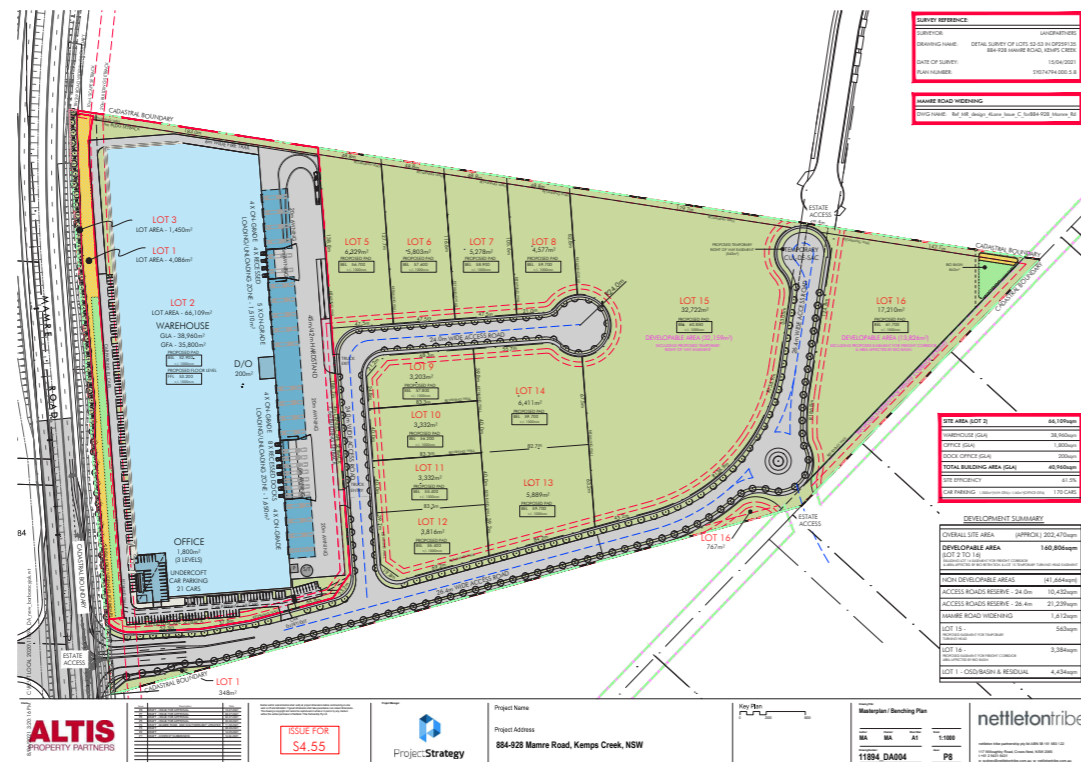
884-928 Mamre Road - Masterplan (Source: Nettletontribe)
